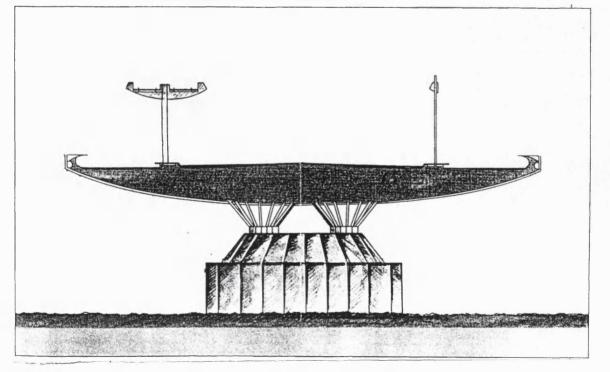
Proposed RER and Underground Station of Masséna (SNCF, 1992)
